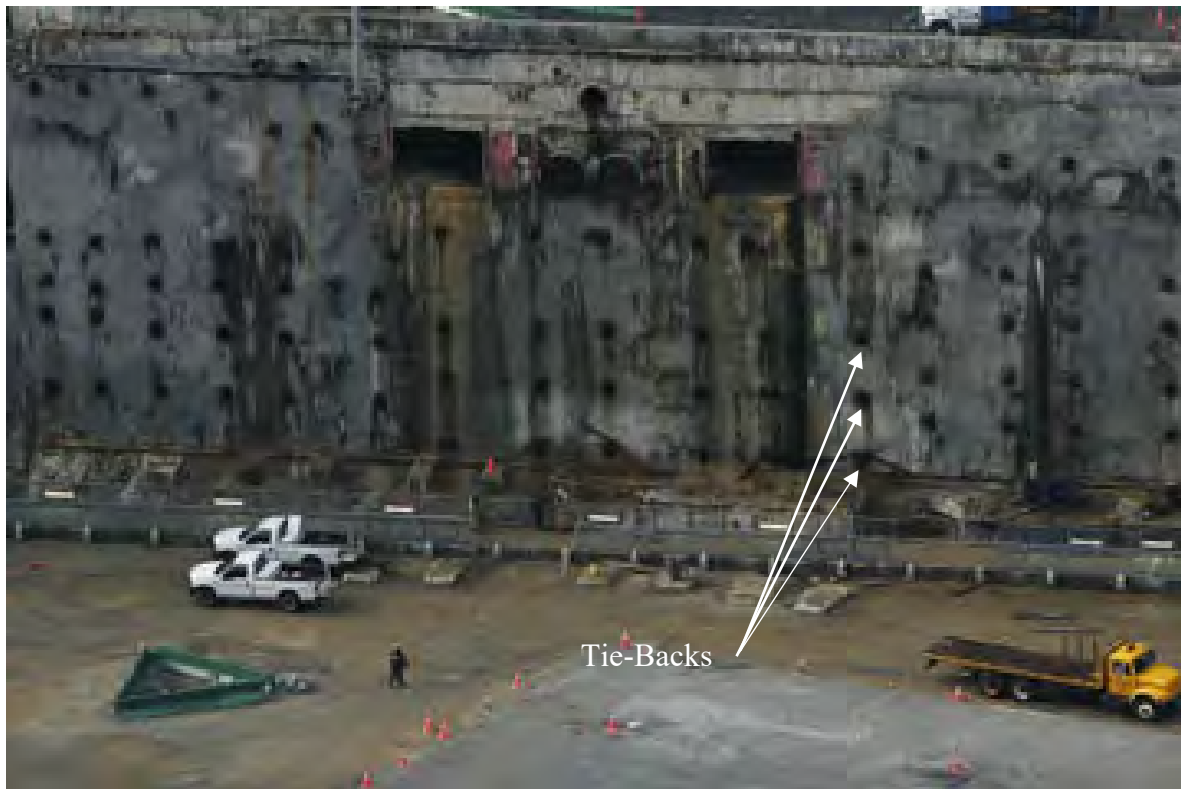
Structural Concrete Cutoff Wall for the World Trade Center
